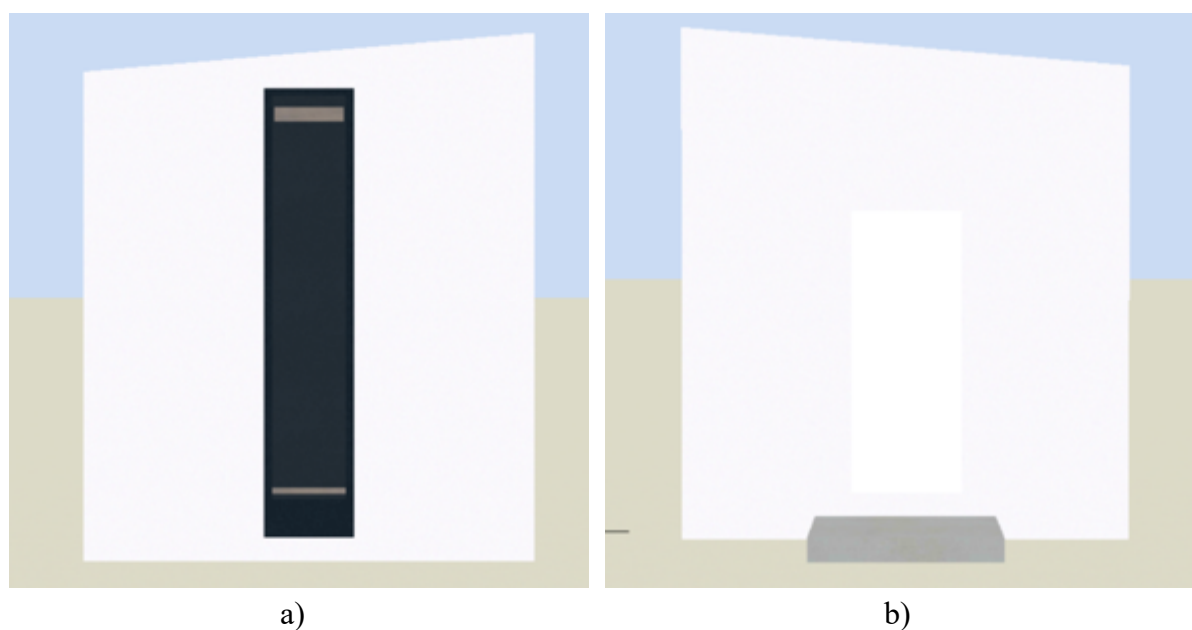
Rendered model of the module 2: a) south facade; b) north facade.
